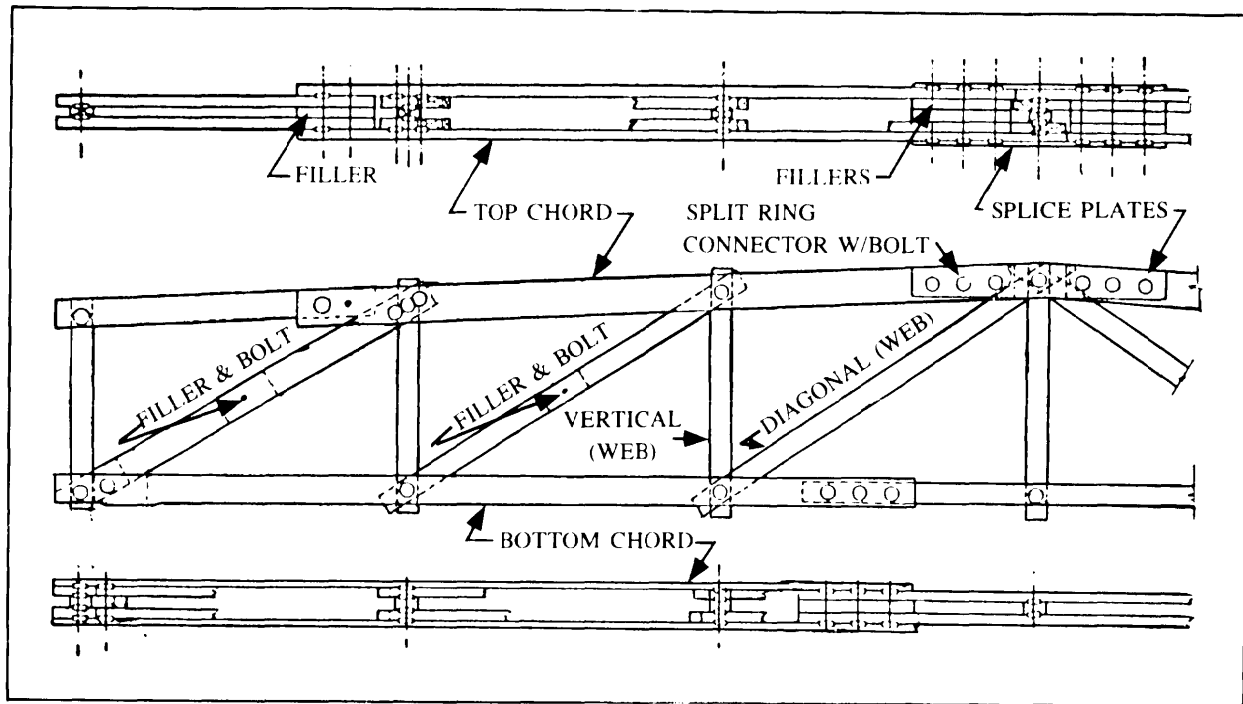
Elements of a typical heavy-timber truss are shown in this elevation plus top and bottom view.
